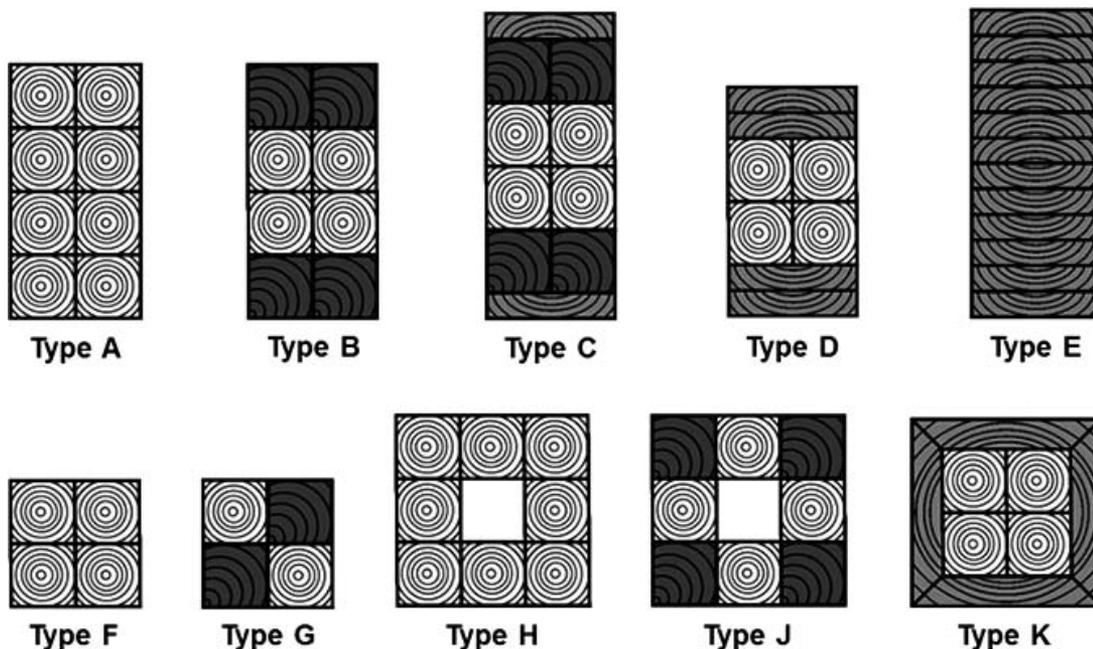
Composition of laminated beam and column specimen. Details are shown in Tables 2 and 3.
